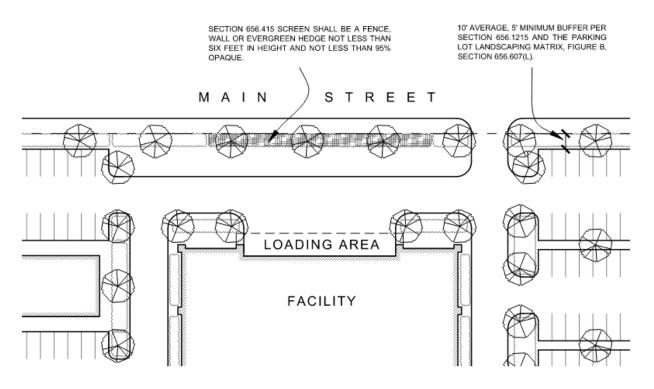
Design Standards for Loading Facilities (not to scale)
